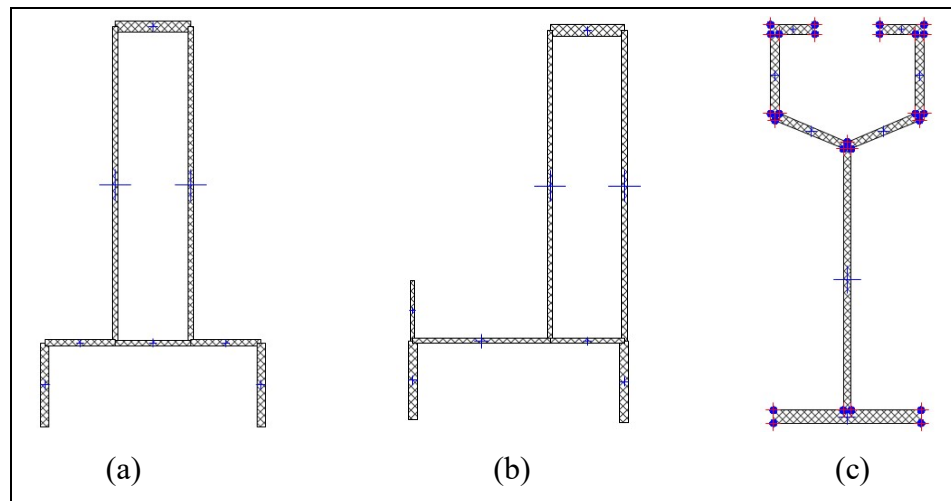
Section designer images of beam members (a) Upper main beam, (b) Lower main beam, (c) Purlins.
